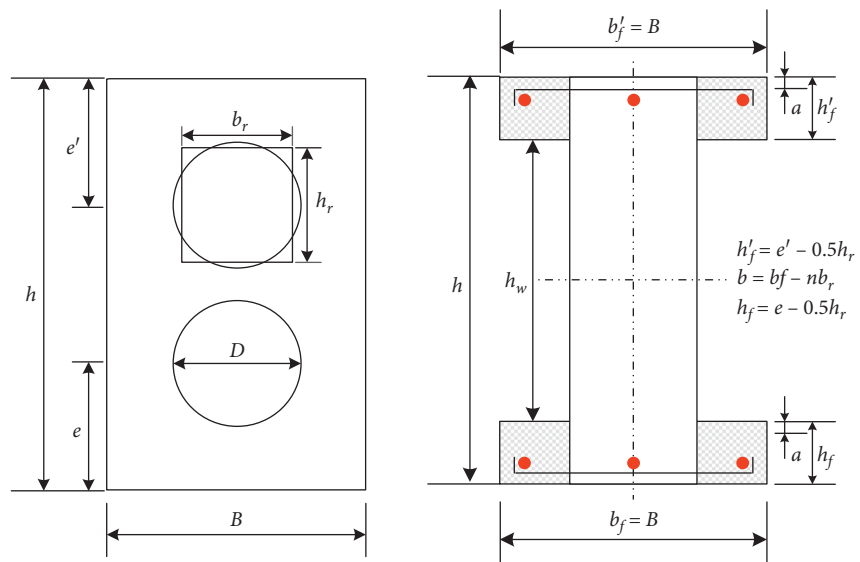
Equivalent I-shaped cross section of the concrete cable duct.
